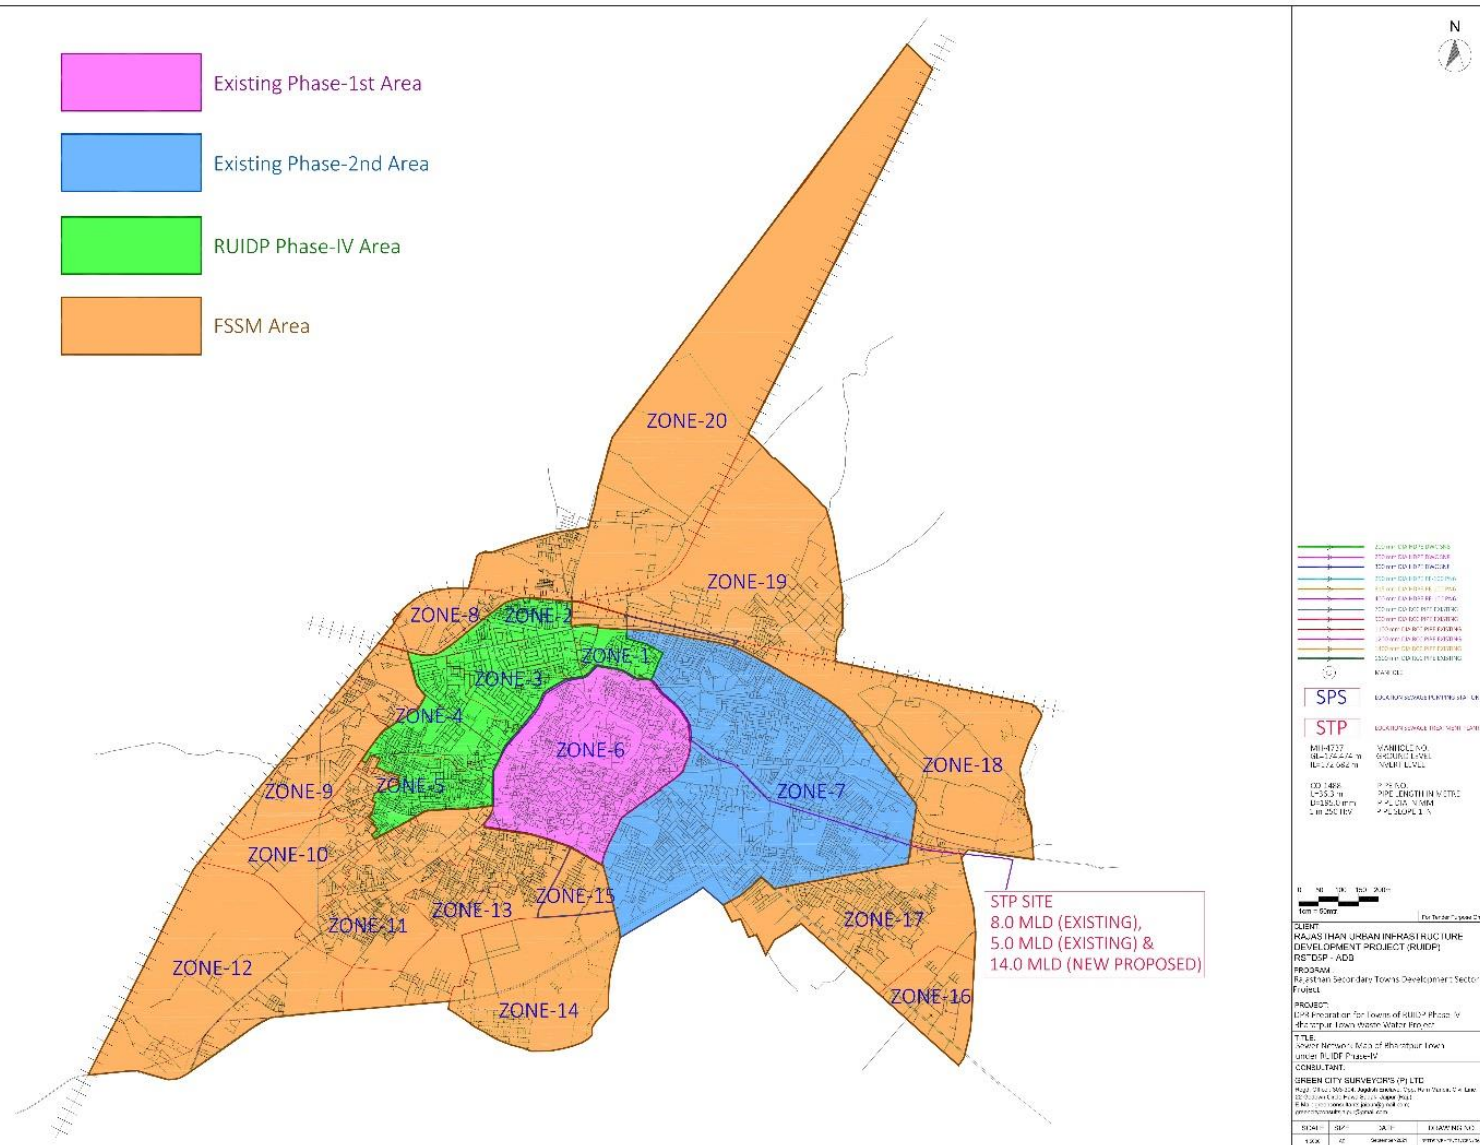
Layout of Proposed Sewer Networks and FSSM areas
